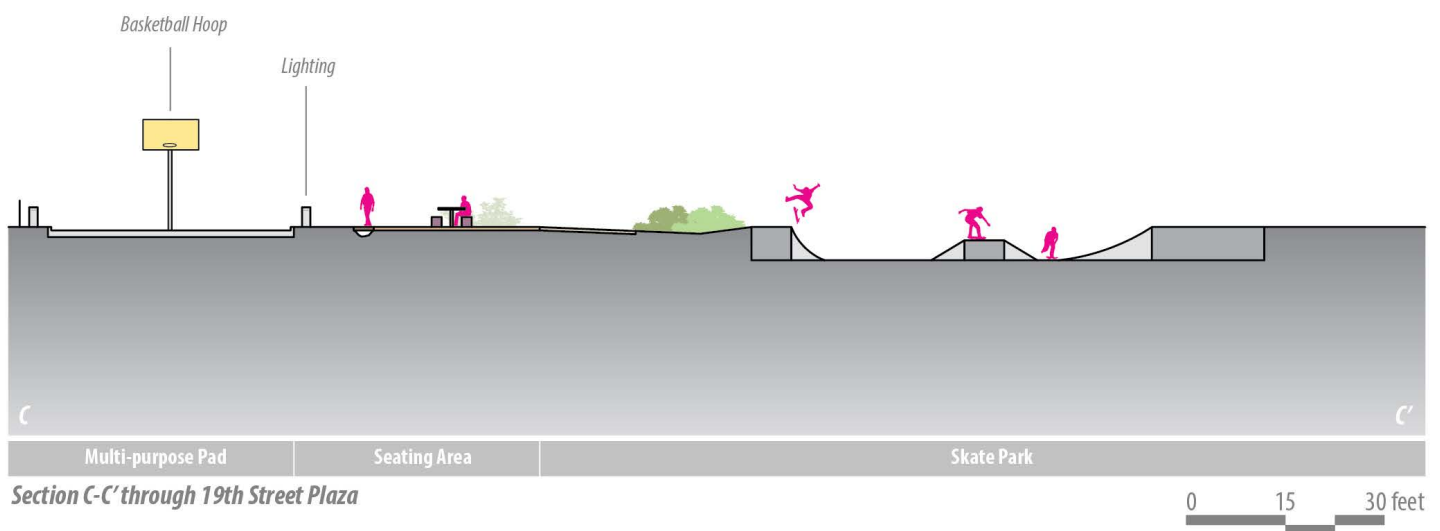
South Wrigley 19th Street Plaza – Concept Plan and Section
